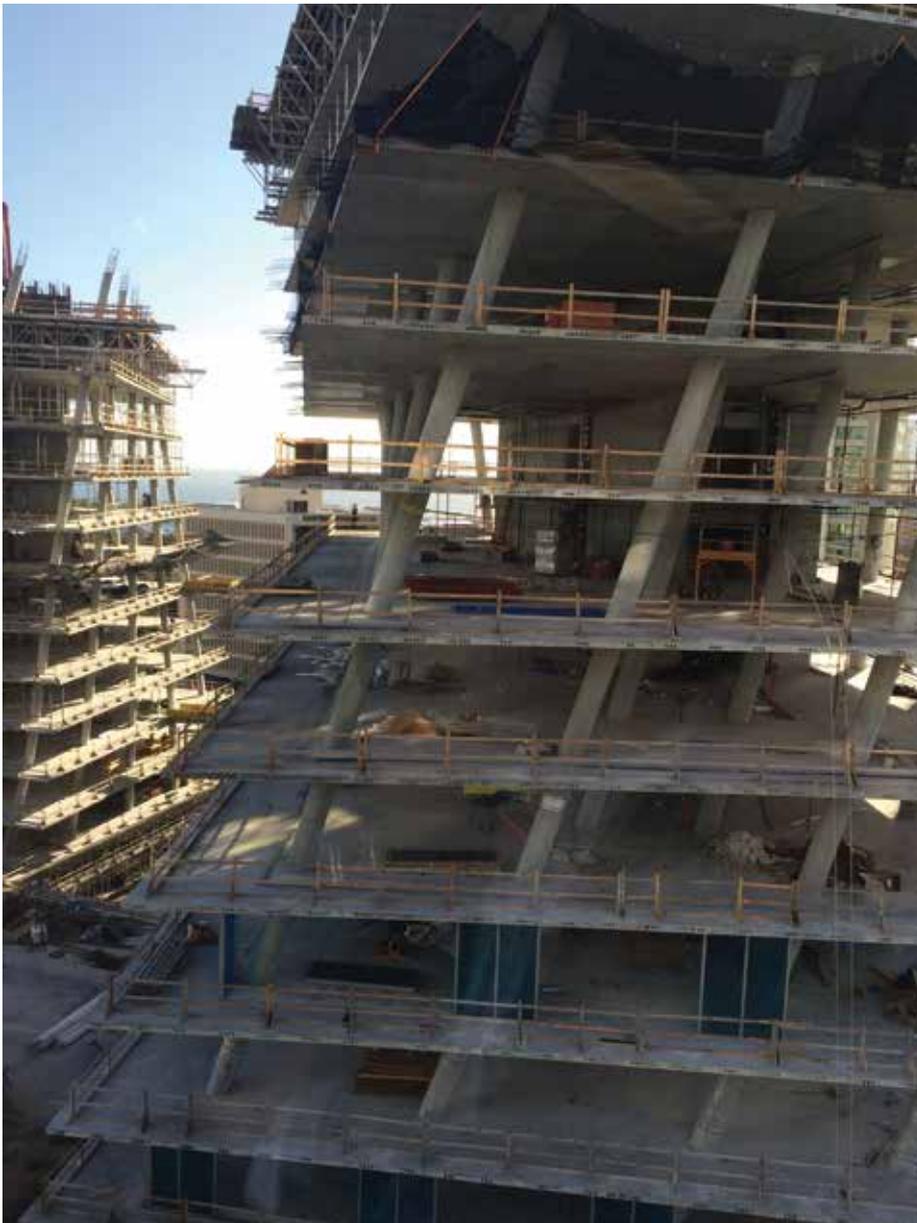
Large cantilevers allowing for outdoor living space (Source: DeSimone Consulting Engineers, PLLC)
